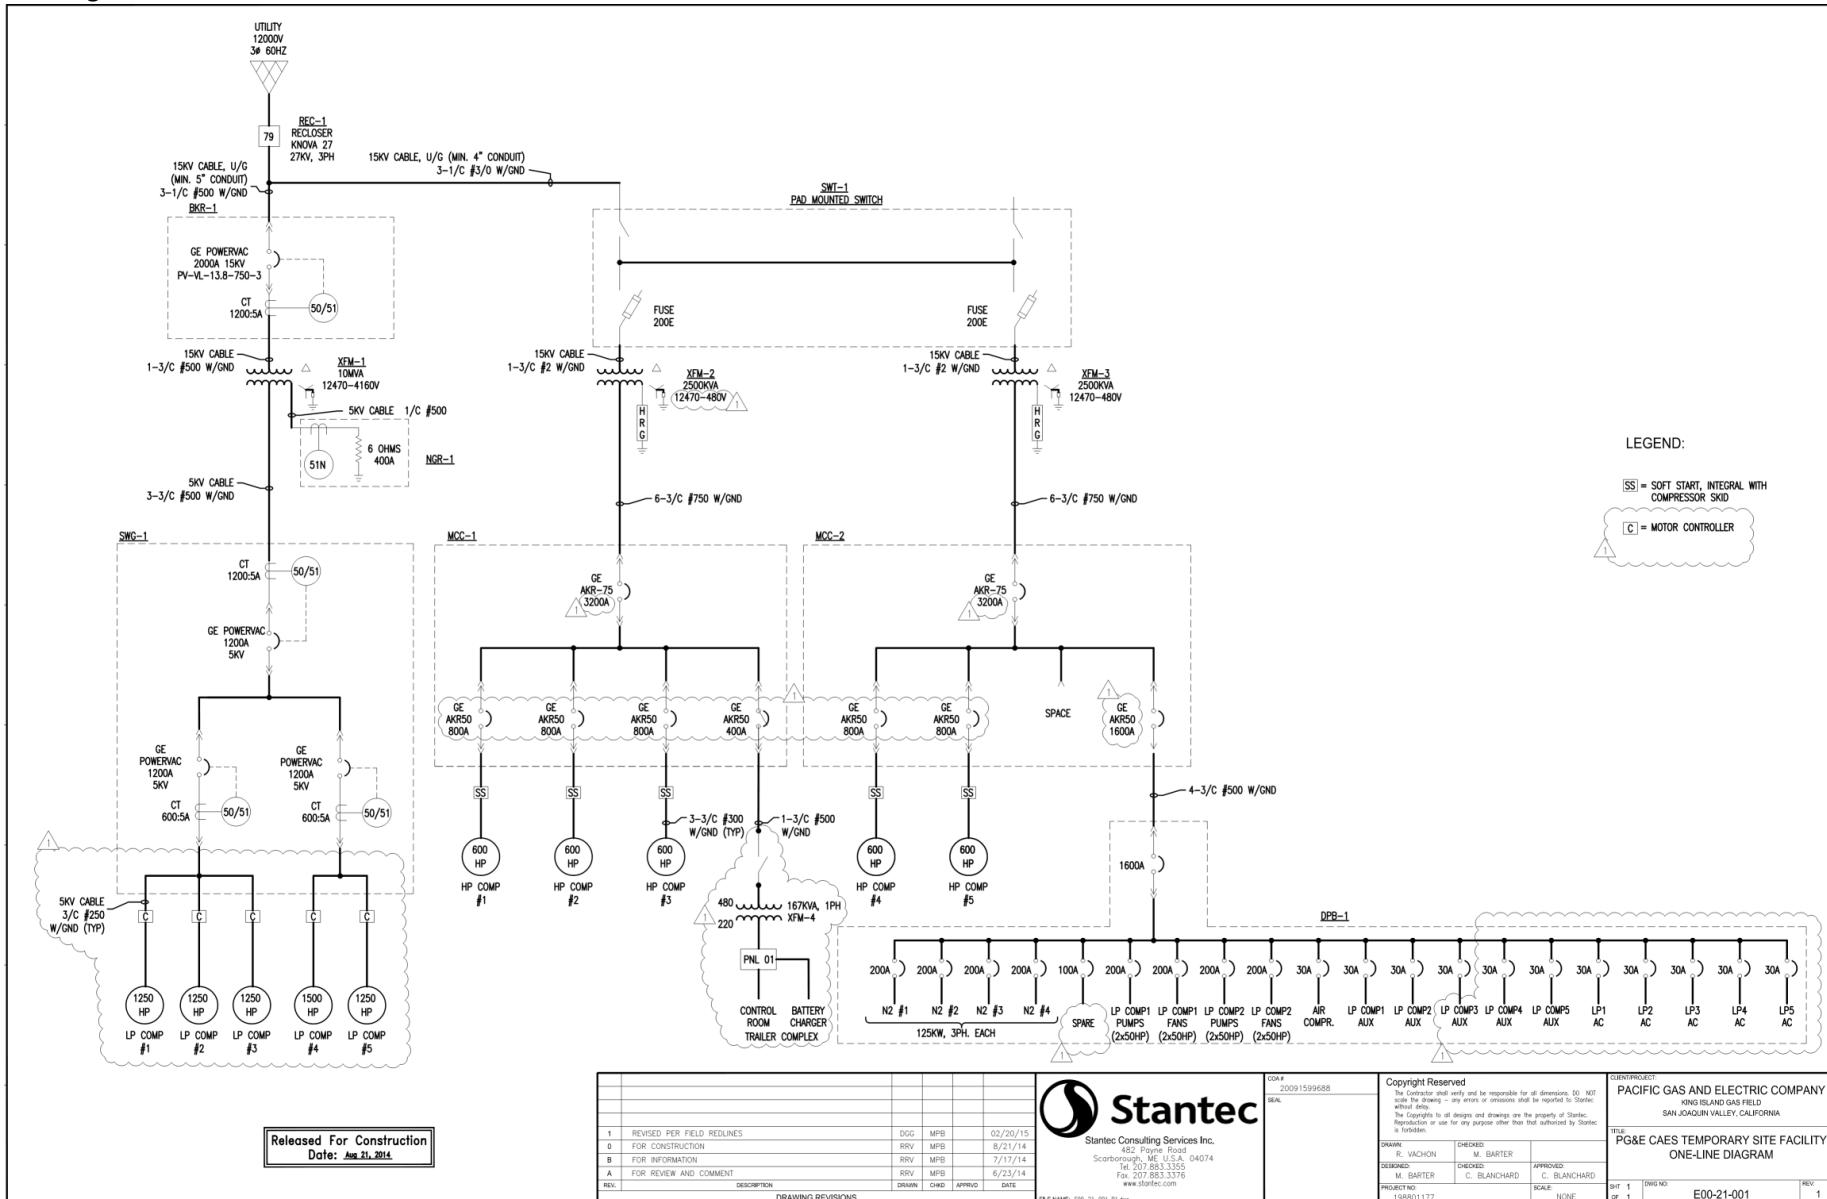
One-Line Diagram of Electrical Connections at TSF
